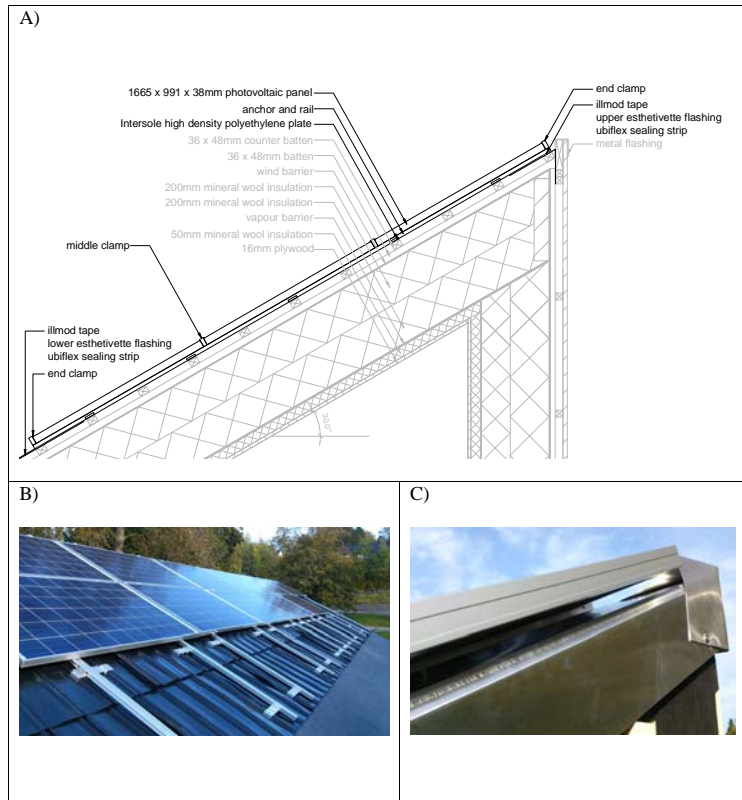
A) Section of the roof construction (adapted from Roald Rasmussen at Skanska), B) Picture of the roof installation, C) End profile
